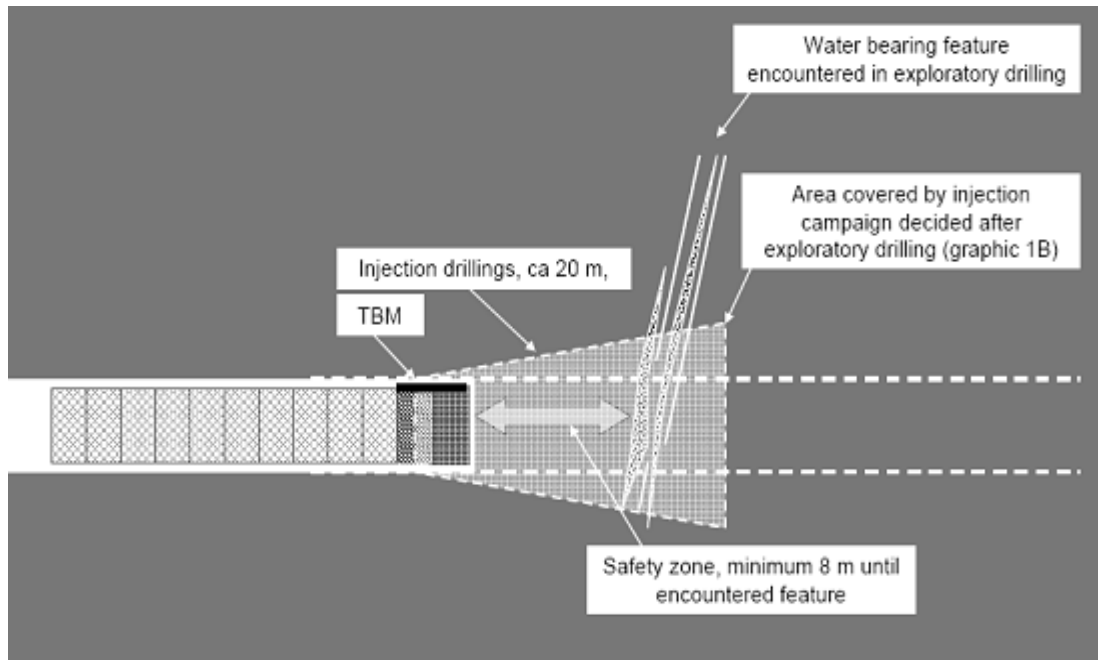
Layout of exploratory drilling scheme ahead of the TBM (Water encountered).
